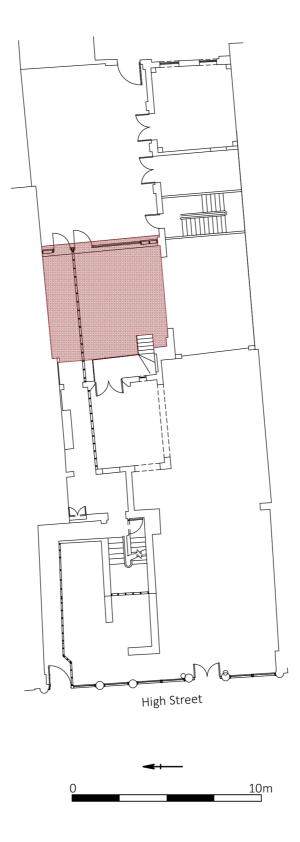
Proposed development with rear extension highlighted (scale: 1:200)
